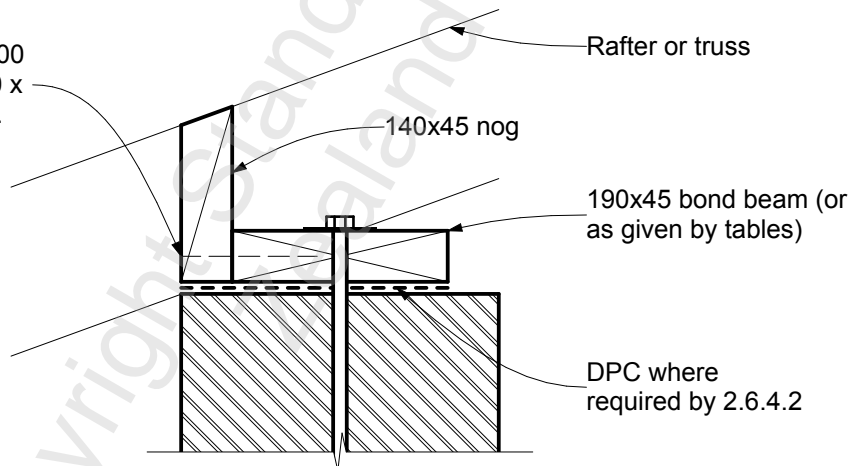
Connection between bond beams and roof without a structural ceiling diaphragm
